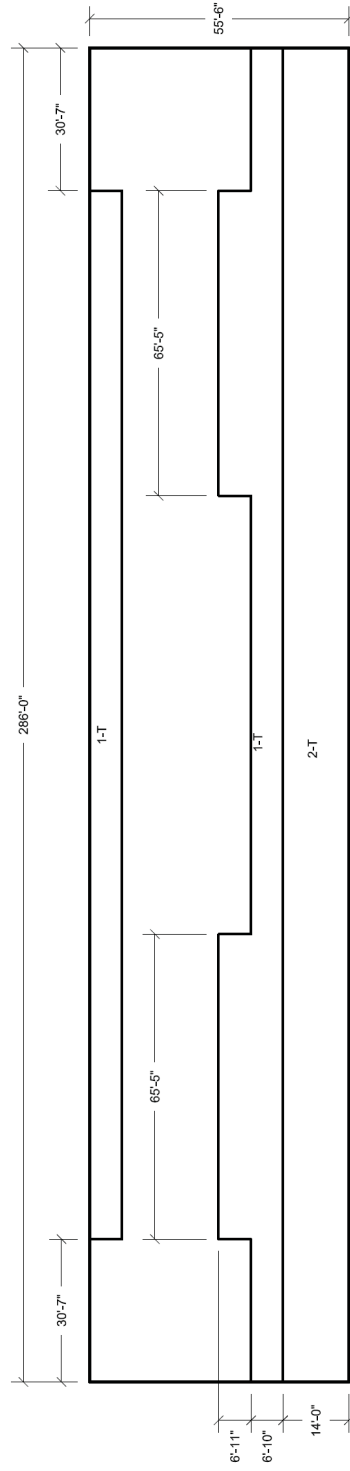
H.6-112: COOLING TOWER NORTH (AND SOUTH) WALL LOOKING SOUTH (NORTH)
